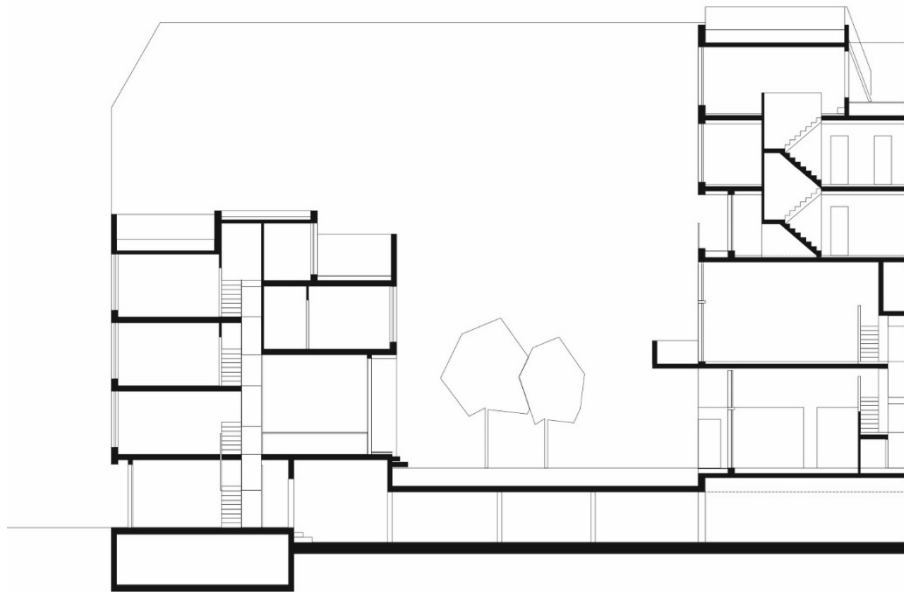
, Section of buildings and courtyard showing height difference. (Source: ArchDaily)
